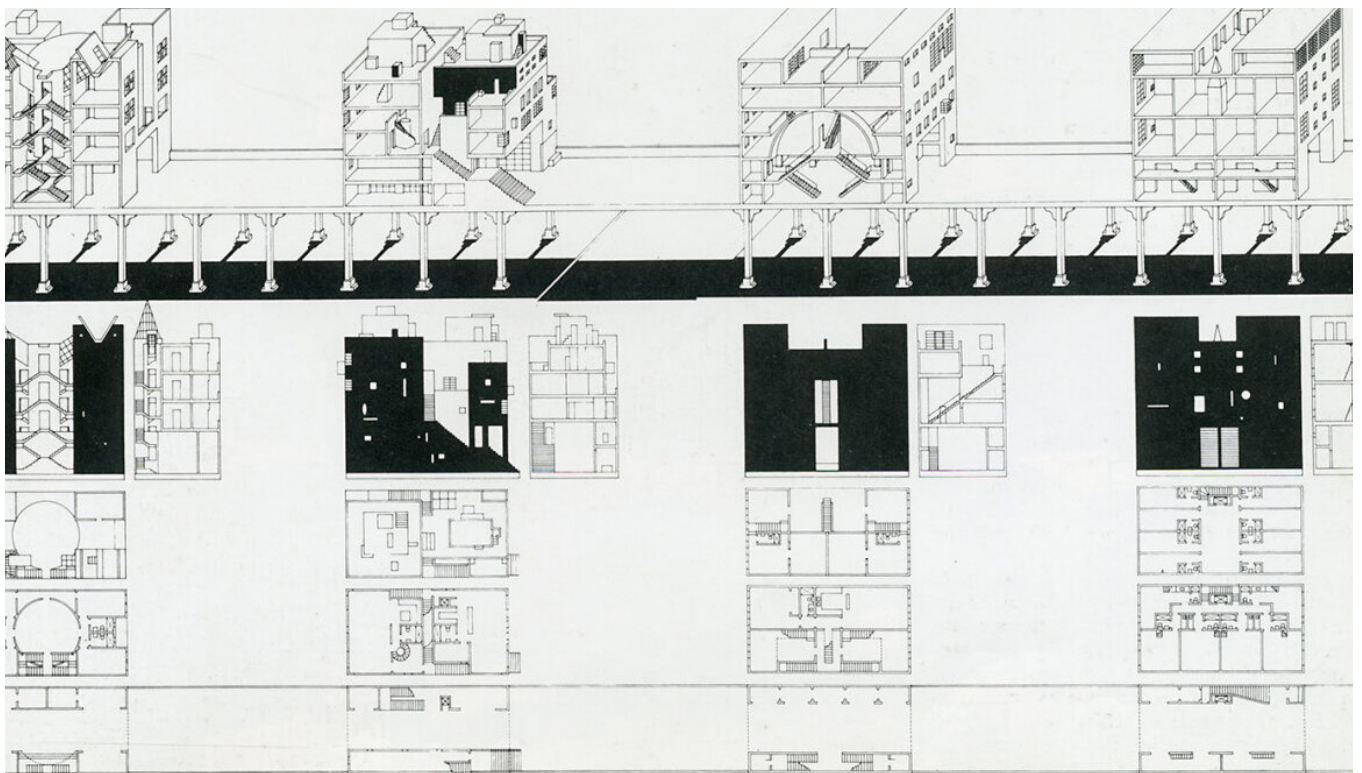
S. Holl, *Manhattan Bridge of Houses*, New York, 1979
